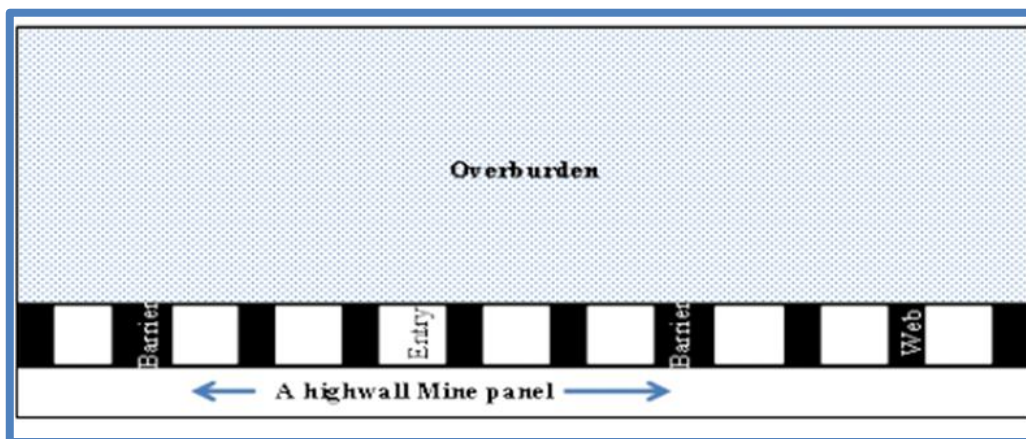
The cross-sectional view of highwall mining layout (after Luo, 2014)
